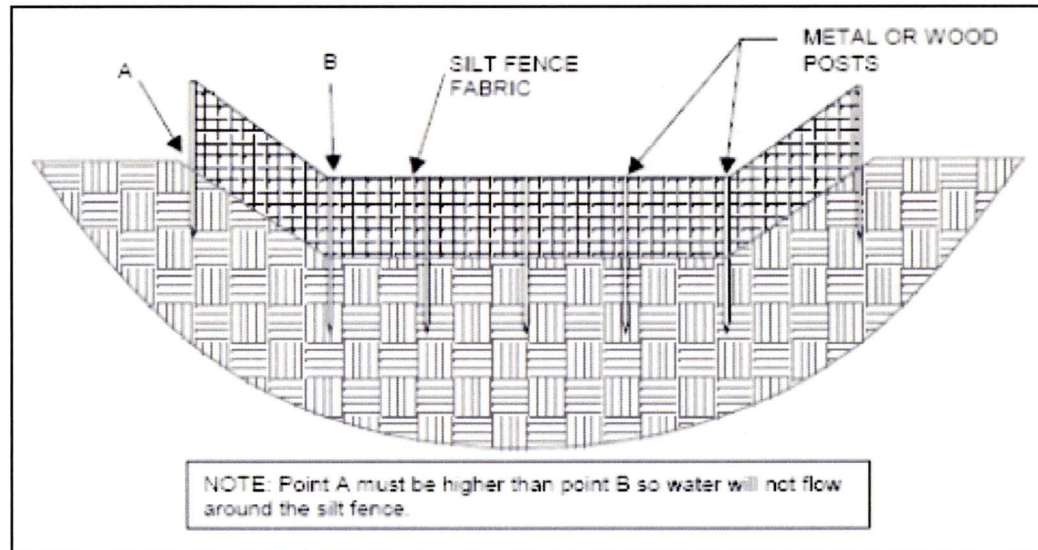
Elevation View - Silt Fence Ditch Check.
